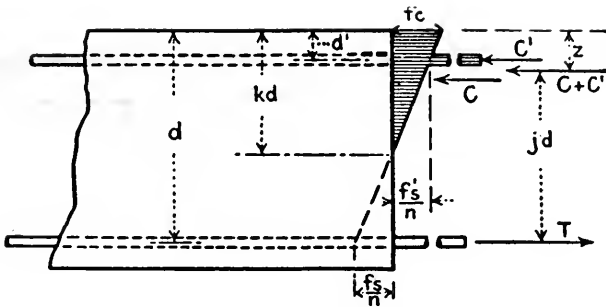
Nomenclature for Concrete Beam Reinforced for Tension and Compression
